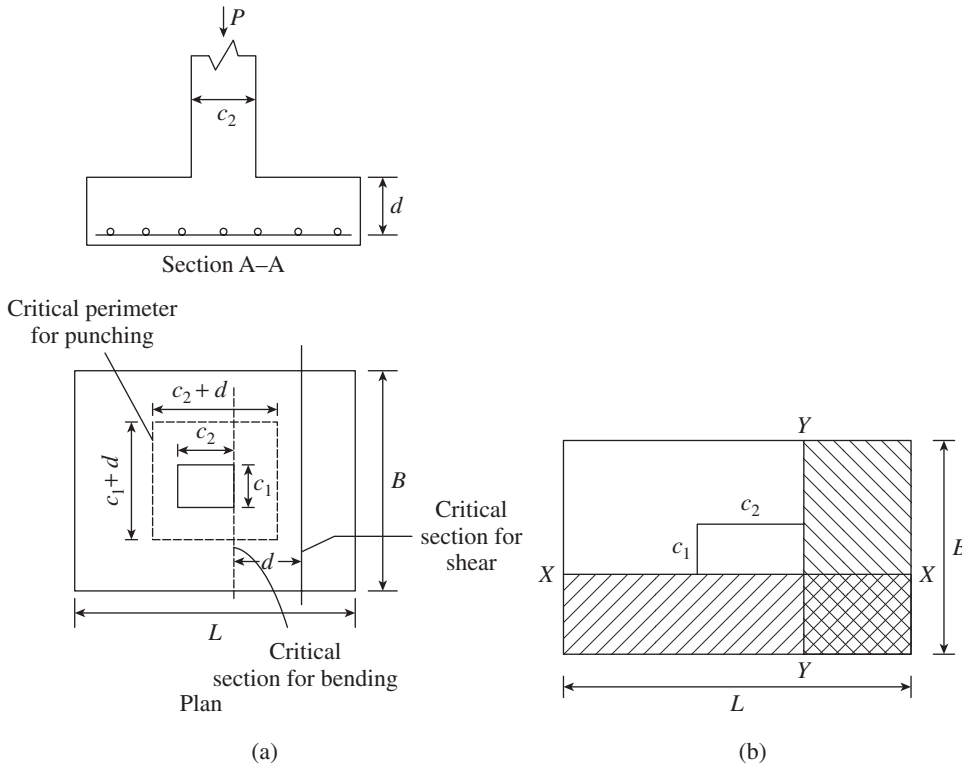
Design of rectangular footing (a) Plan and elevation (b) Critical sections for bending moment
